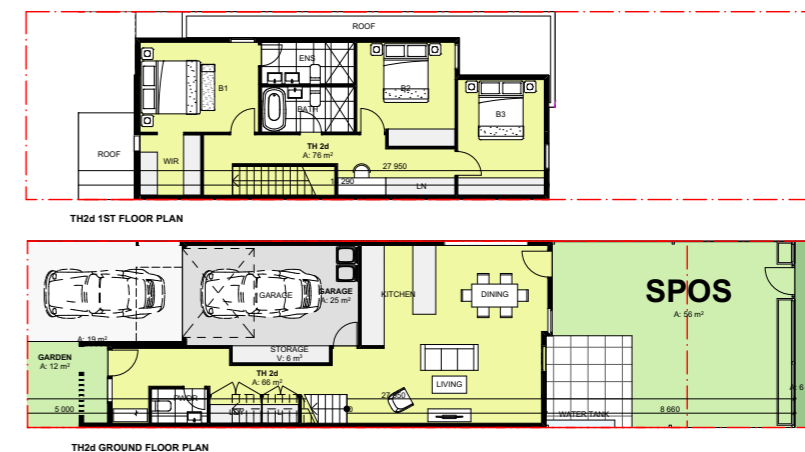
Townhouse Type 2d (Source: Plus Architecture)
